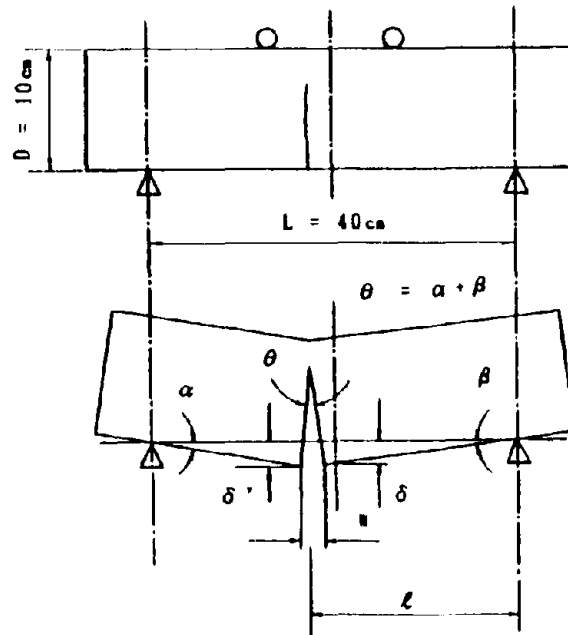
Deformation model of fiber mixed concrete specimens in bending
